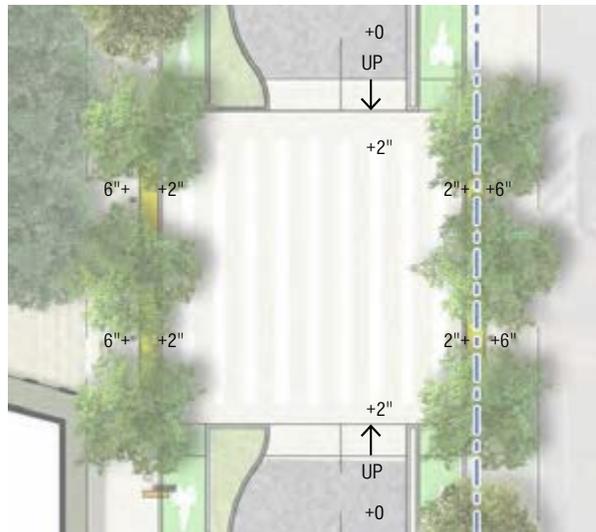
Raised Crosswalk at Lee Avenue and Reservoir Park
